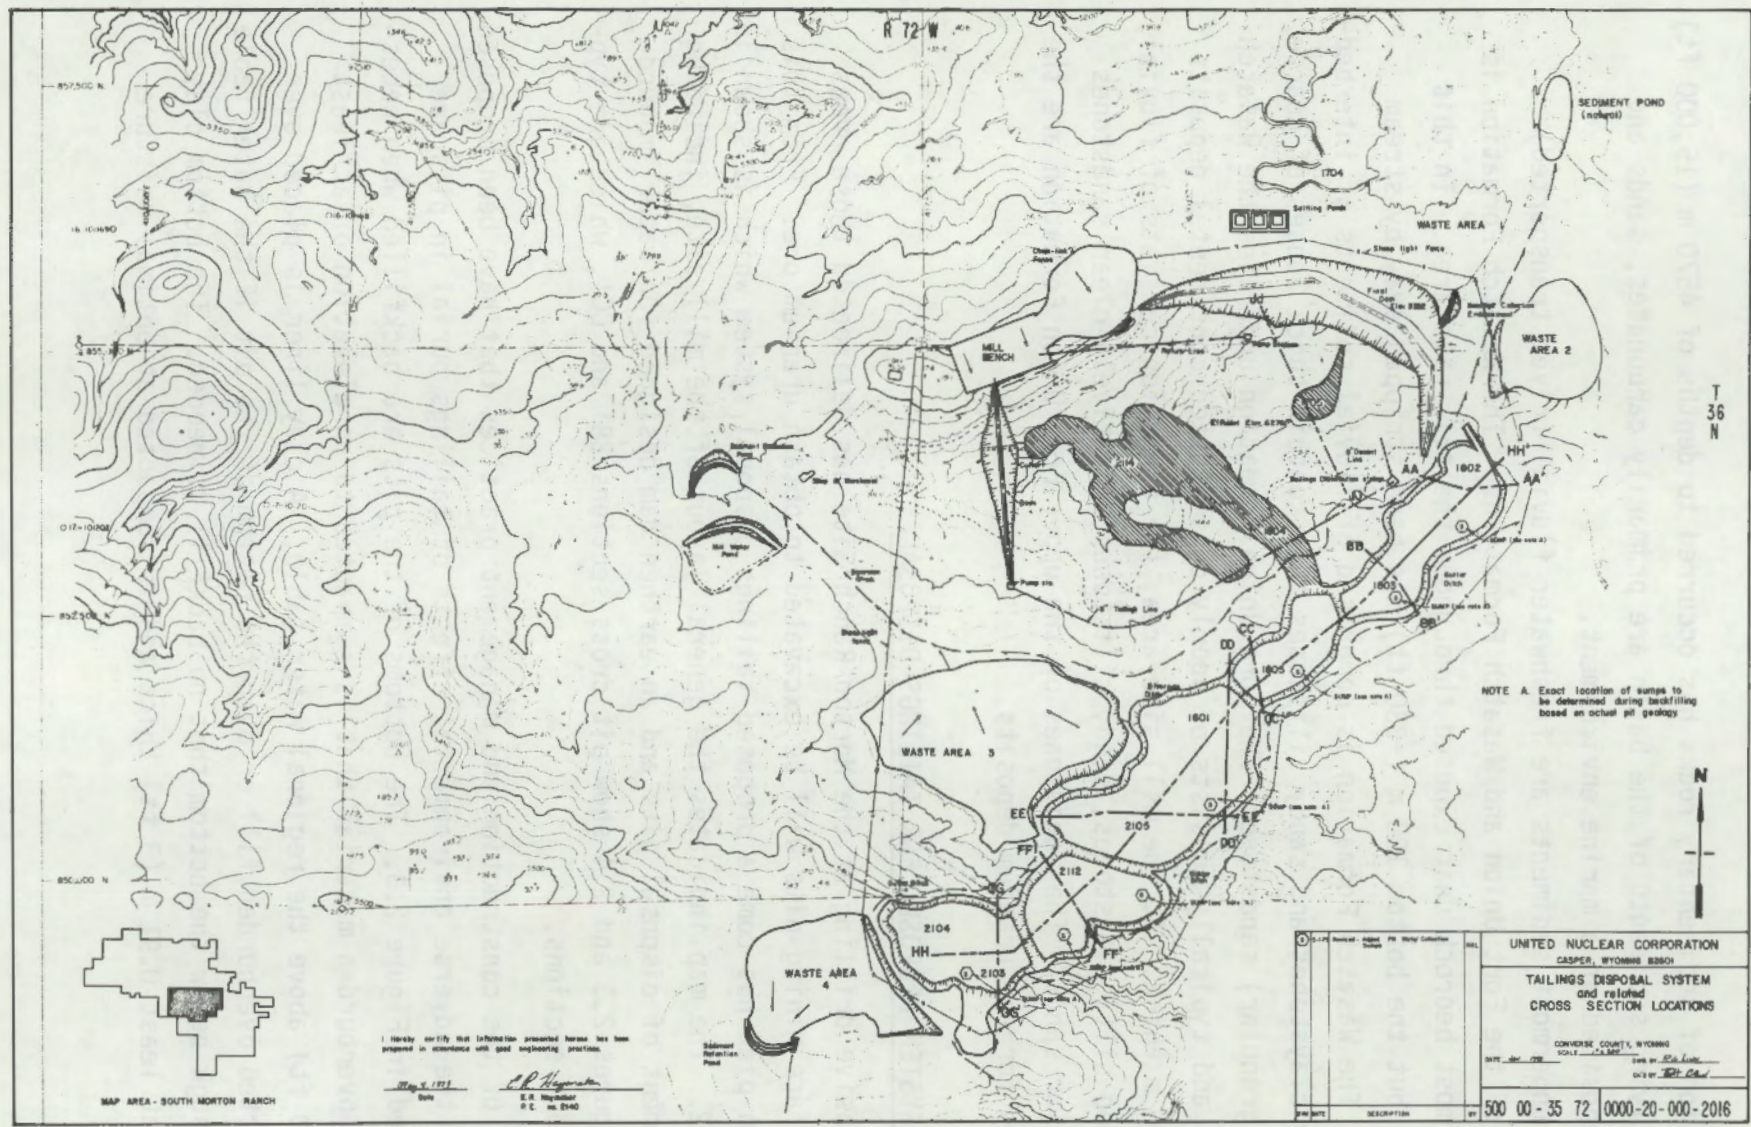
Tailings Disposal System and Related Cross Section Locations at Morton Ranch Mill Site
